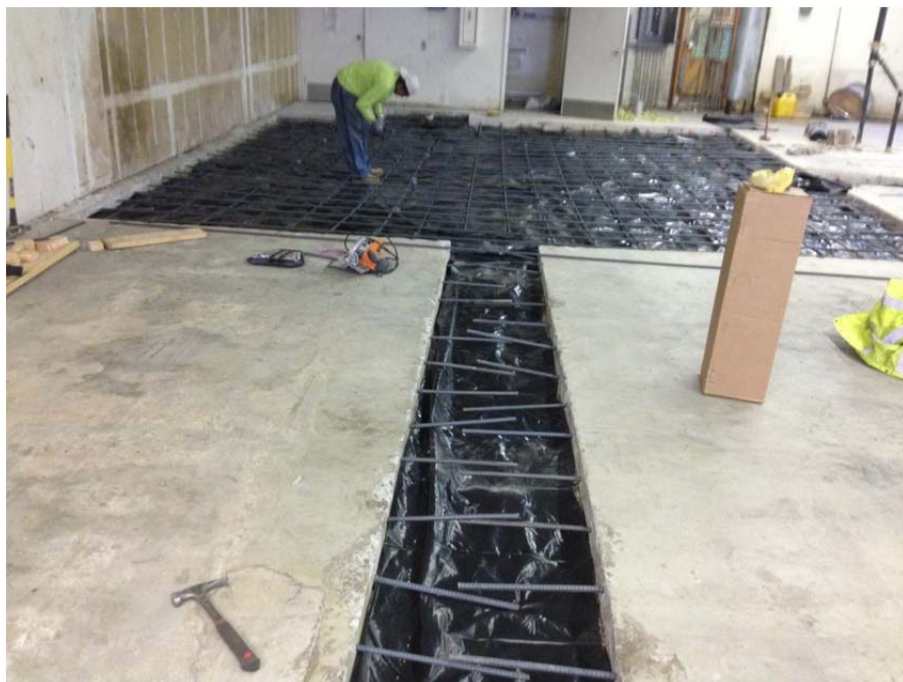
Sub-slab depressurization system through shear wall from the 7102 tenant space into the 7104 tenant space.
